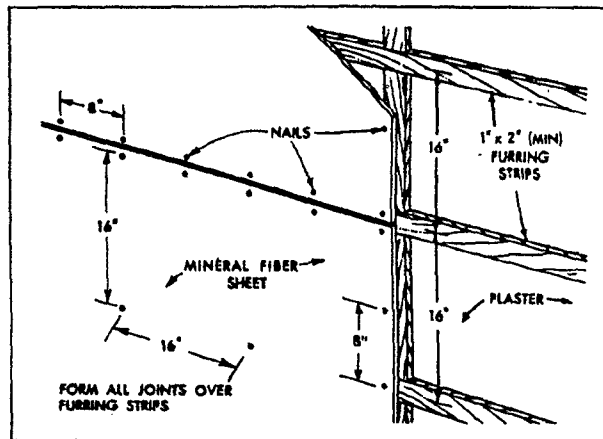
INTERIOR WALLS, OVER PLASTER - Install 1 in. x 3 in. furring strips on 16 in. centers and apply Flat Sheets. Form all joints over furring strips.
